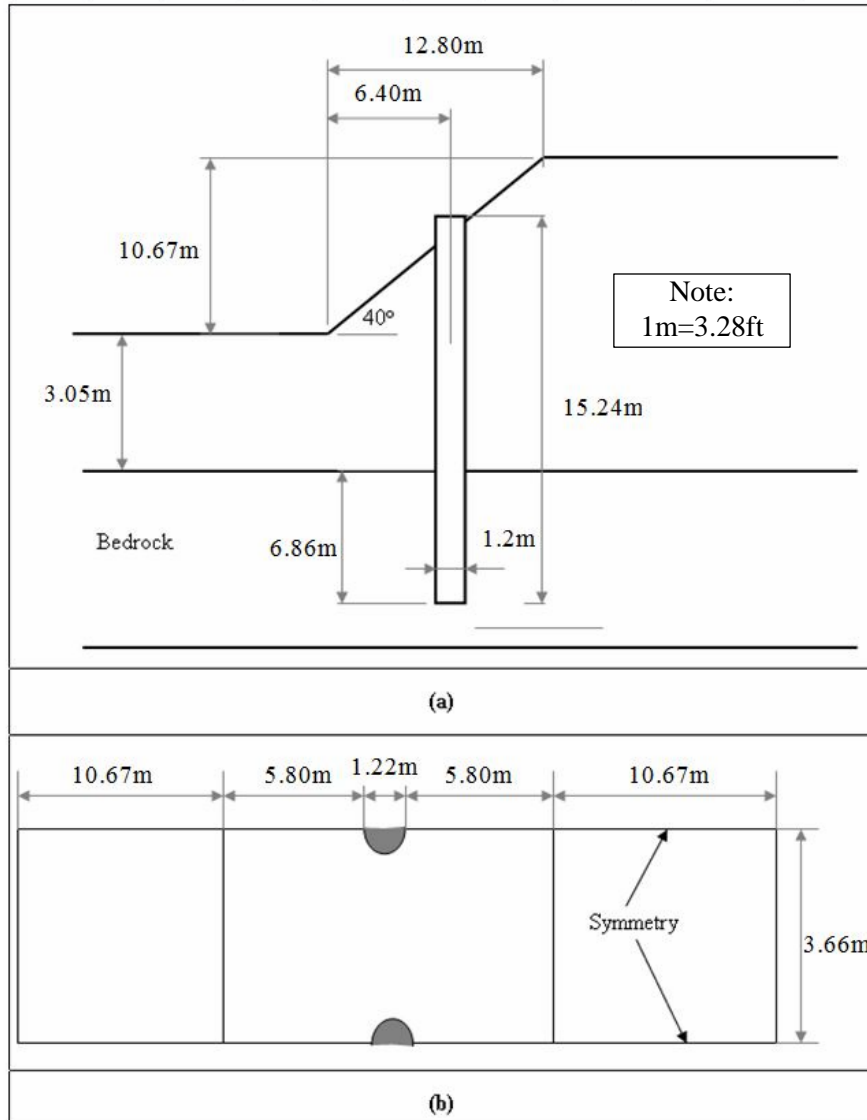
Geometry and dimensions of the 3D model a) Cross-section b) Top view
